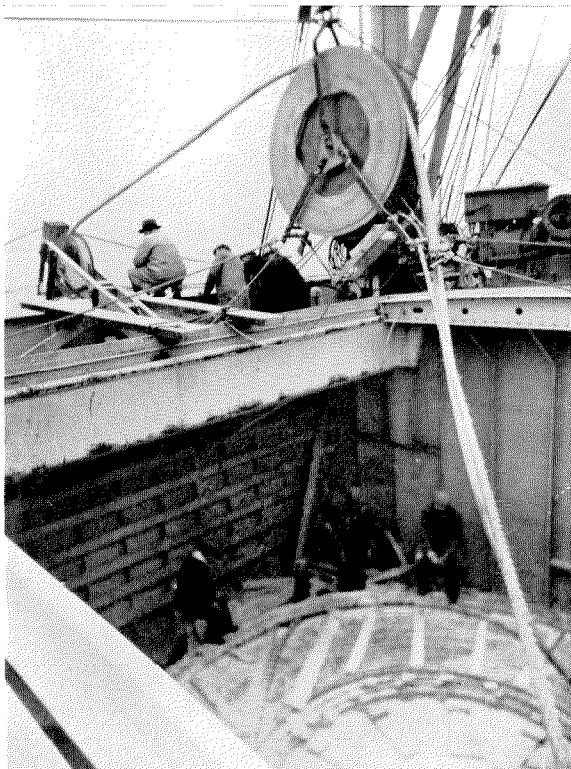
River Tay Crossing—Paying out Cable via Large Sheave and Special Jockey Sheave.
